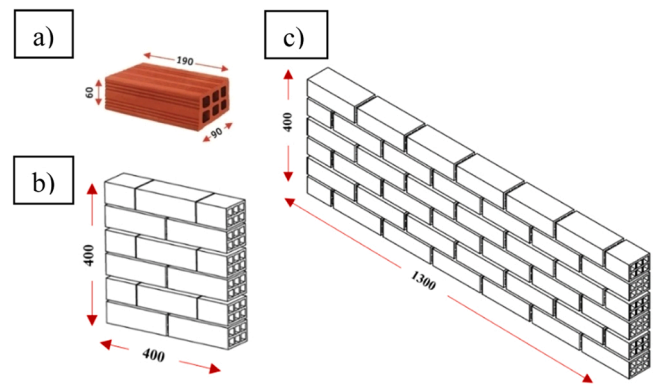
Schematic representation of perforated fired-clay brick masonry walls: a) perforated clay brick; b) compression test specimen; c) beam-type wall specimen.
